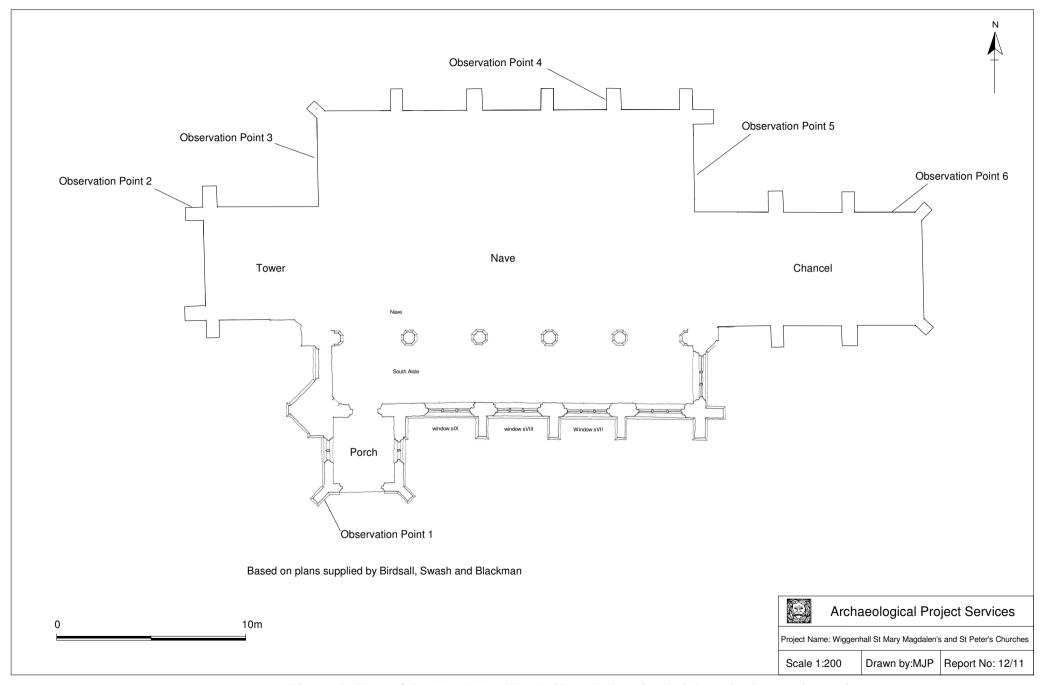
Plan of St Mary Magdalen's Church showing brickwork observation points
